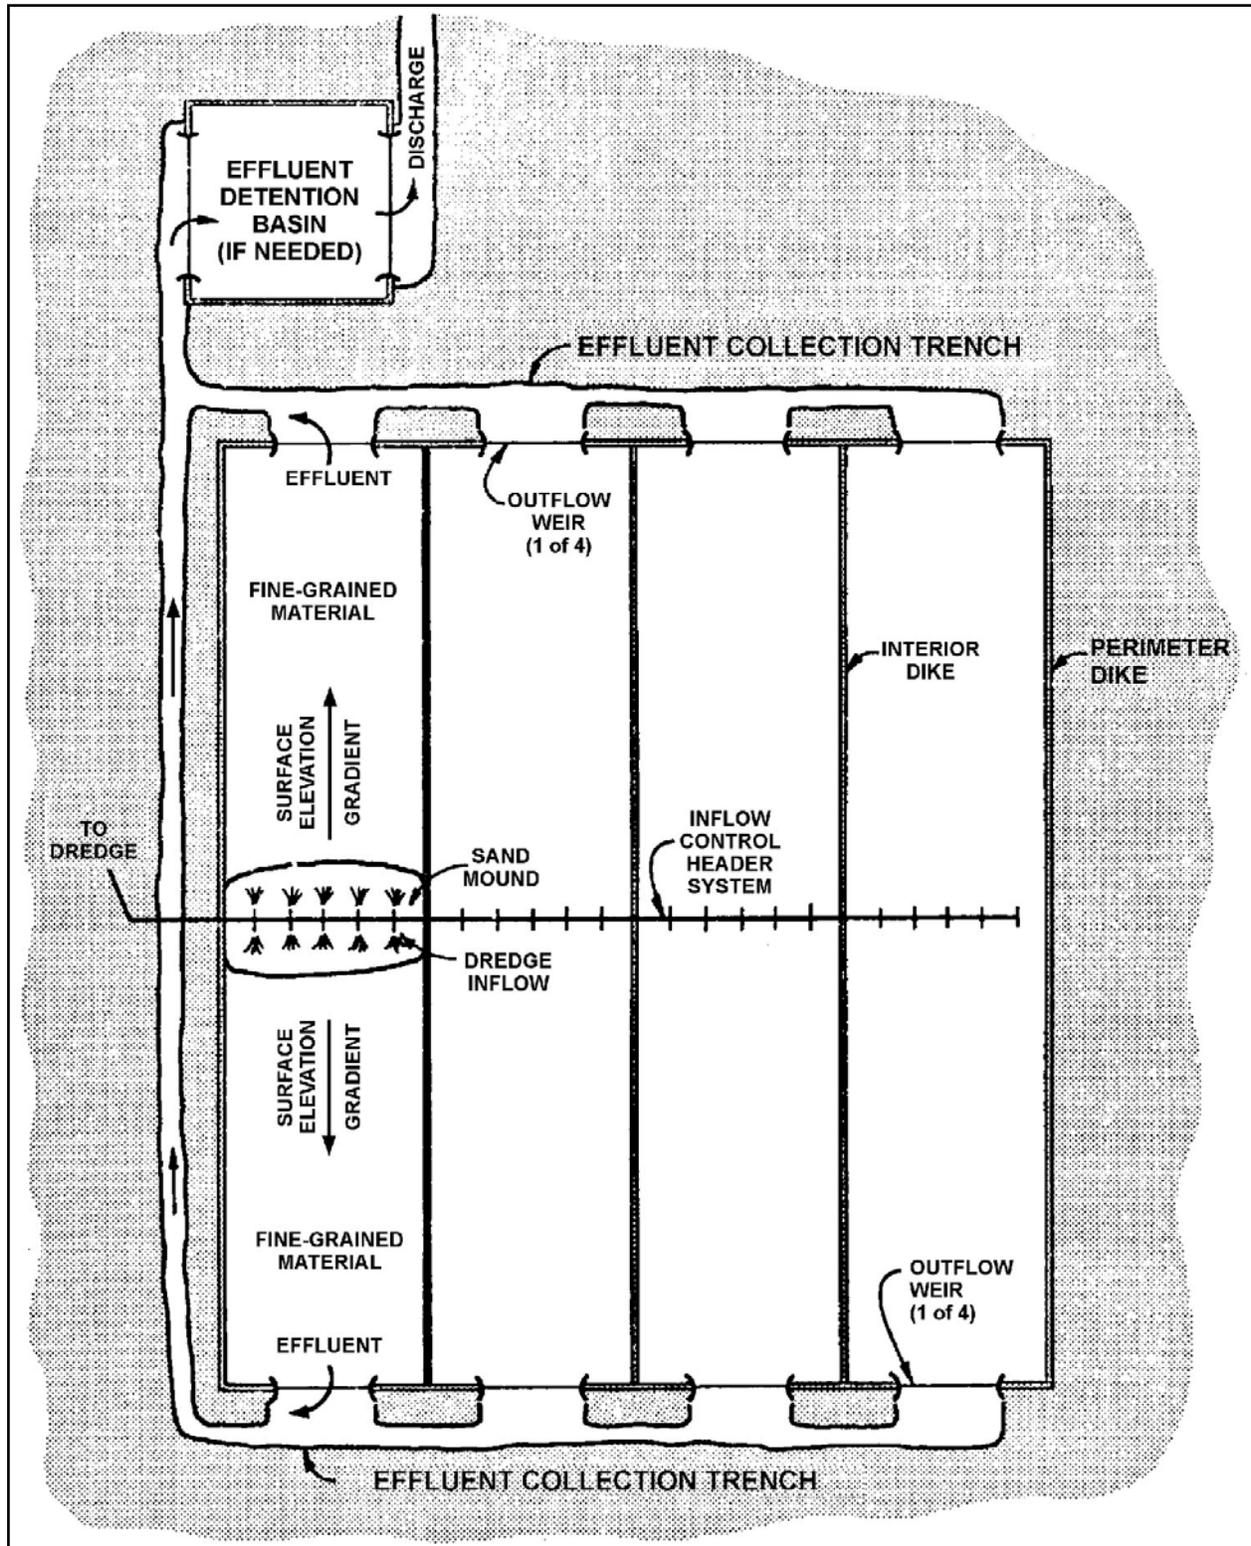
Conceptual Illustration of a Placement Site Layout to Permit Parallel Compartment Use and Produce Surface Topography Facilitating Future Dredged Material Dewatering
